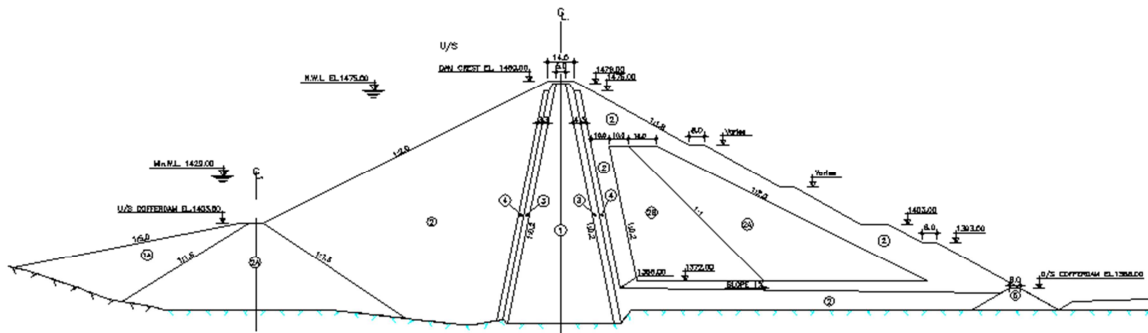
Typical cross-section of Azad earth dam (Iran Water and Power Resources Development Company, 2008)
